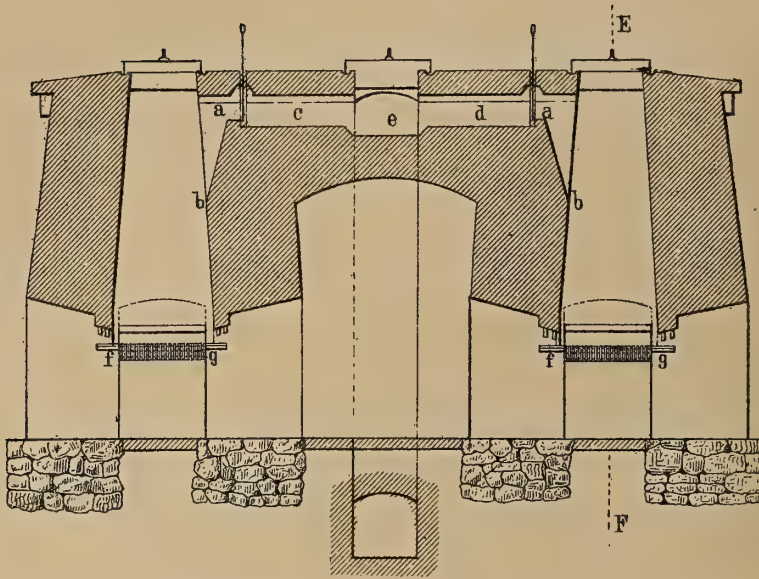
VERTICAL SECTION OF HODECK PRODUCERS
